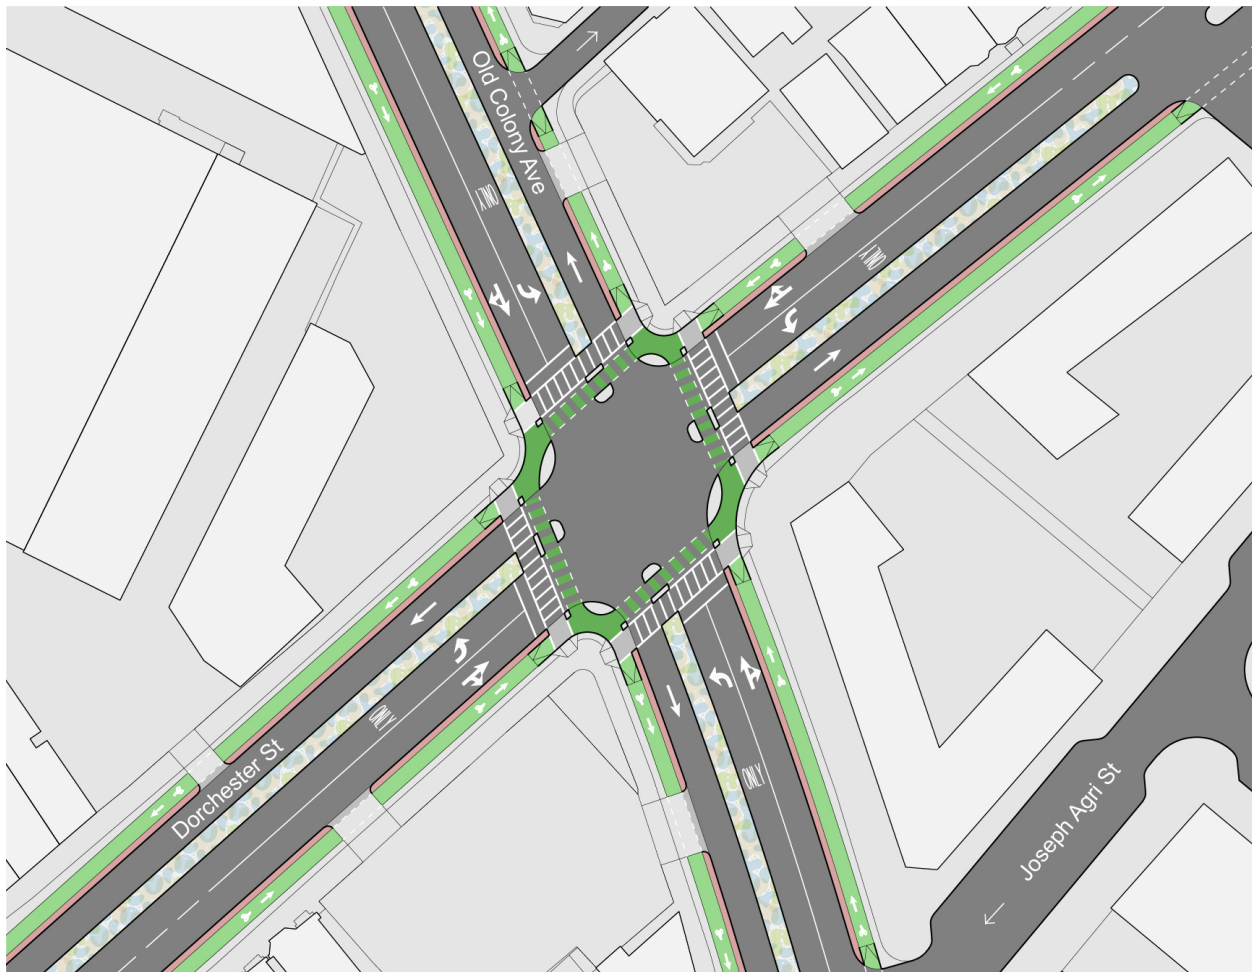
Dorchester Street and Old Colony Intersection Long-Term Improvements - Plan View
